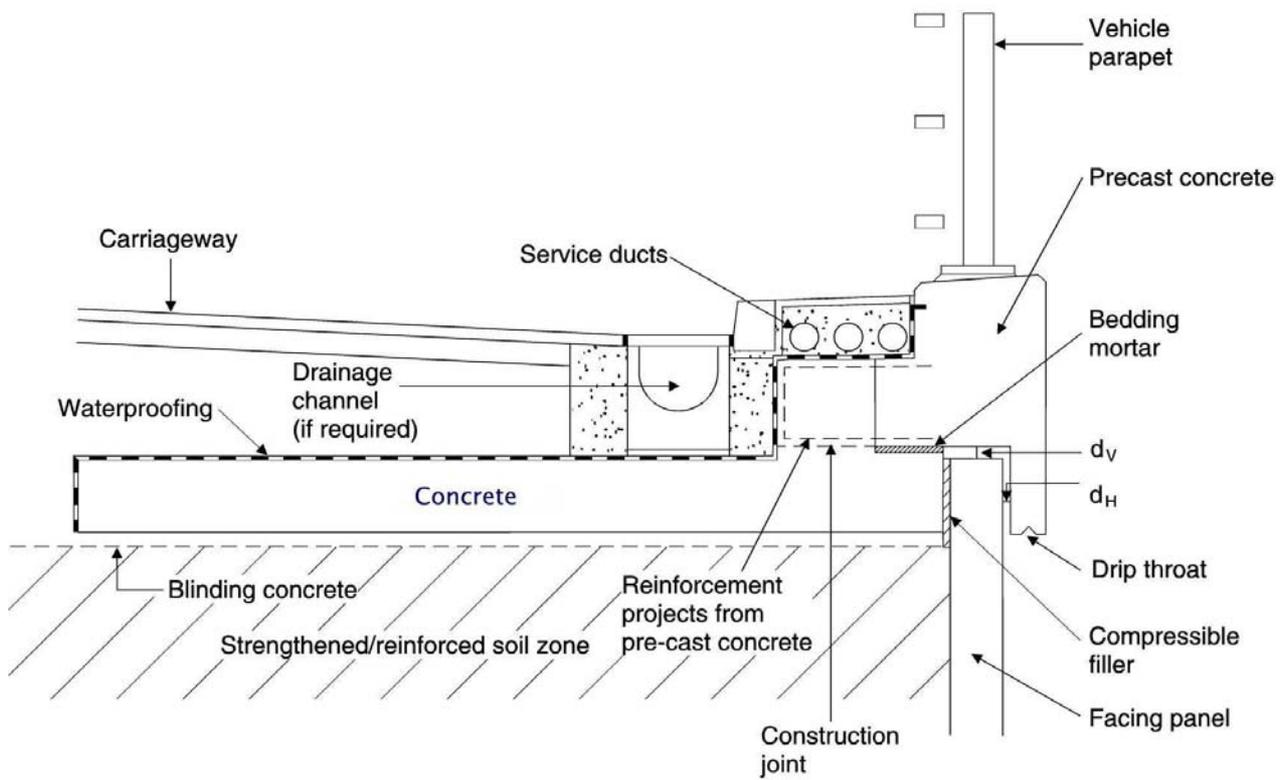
Typical detail of a parapet-supporting base slab at the top of a strengthened/reinforced soil wall with pre-cast concrete coping
